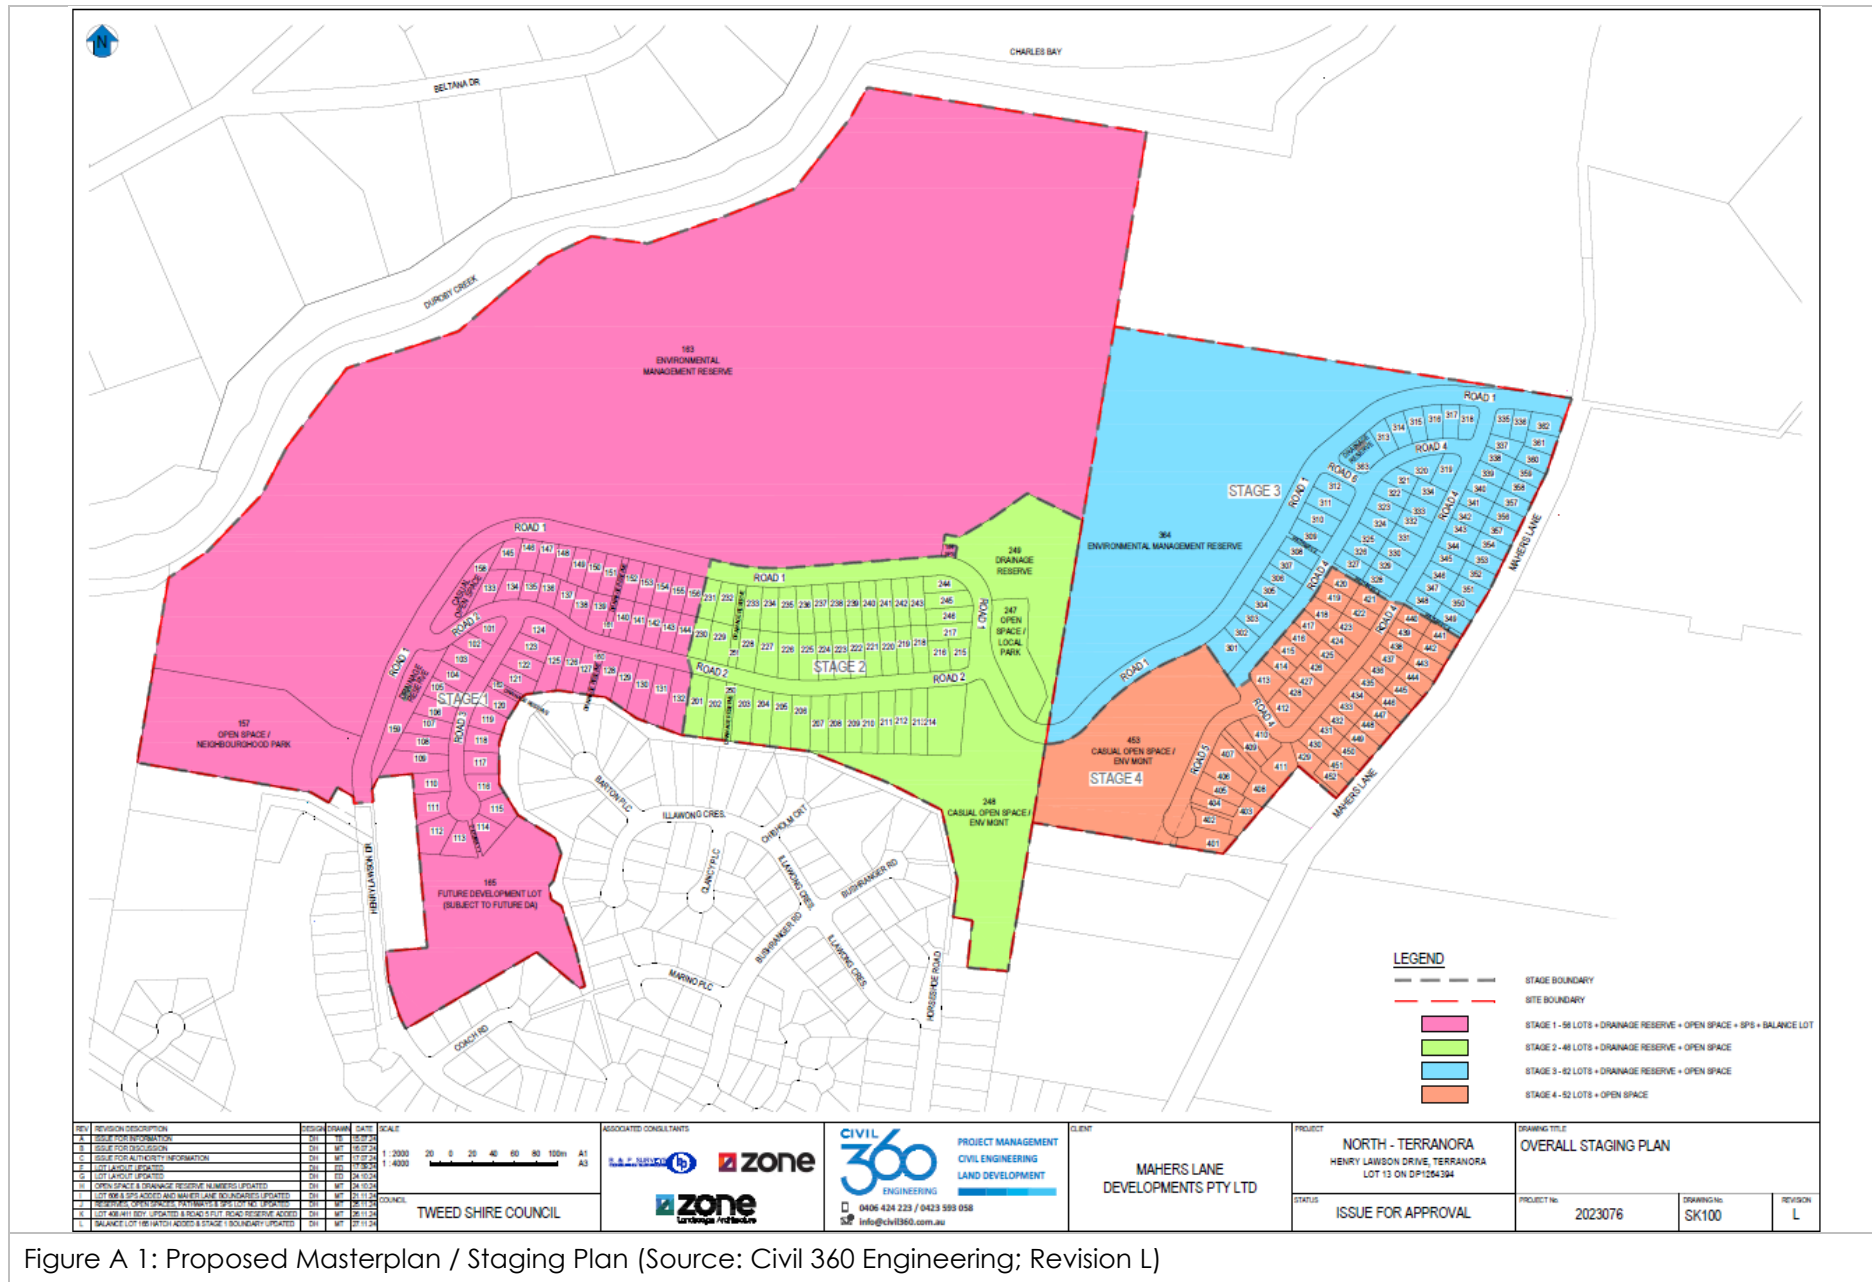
Proposed Masterplan / Staging Plan (Source: Civil 360 Engineering; Revision L)
